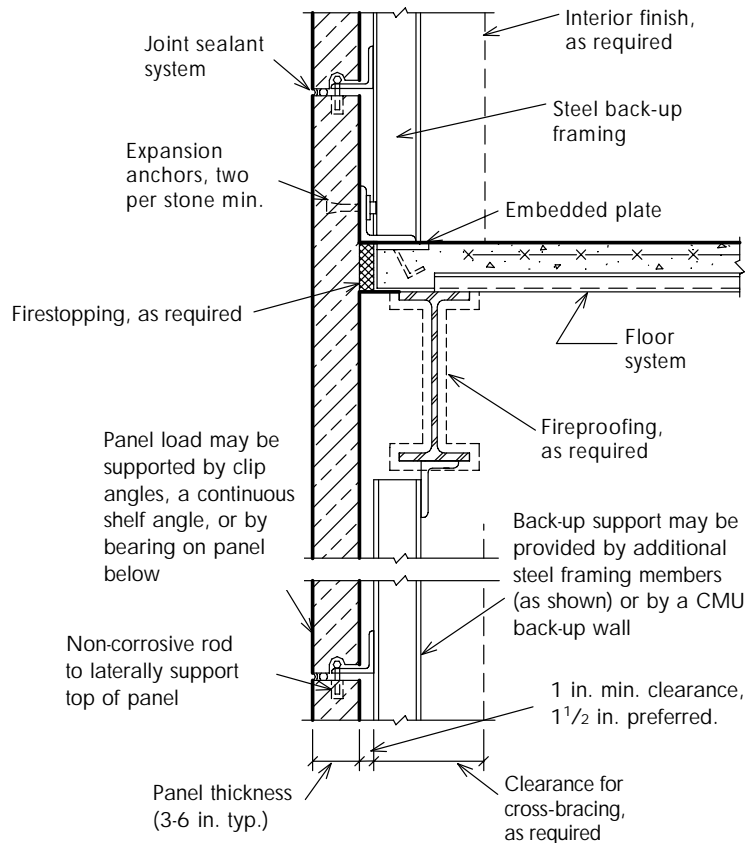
Detailing Considerations for Limestone Panels (Wall Section Detail)
